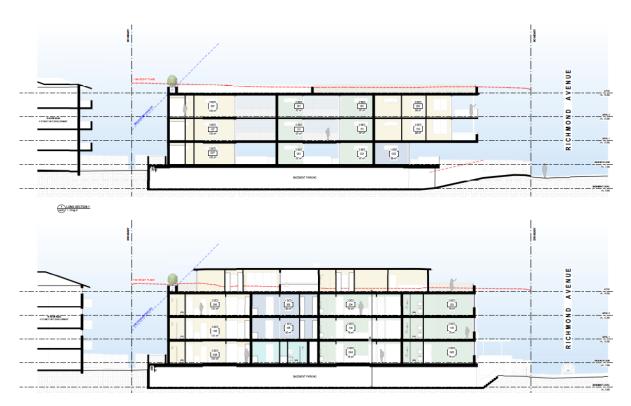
long sections of the proposed building and the extent to which they relate to the 11m height plane
